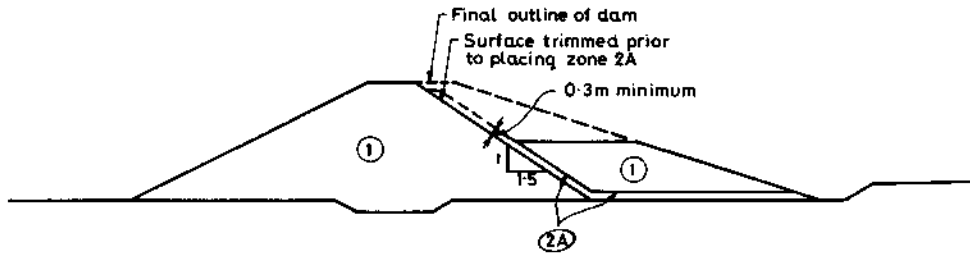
Construction of inclined chimney drain by placement on downstream slope of earthfill.
